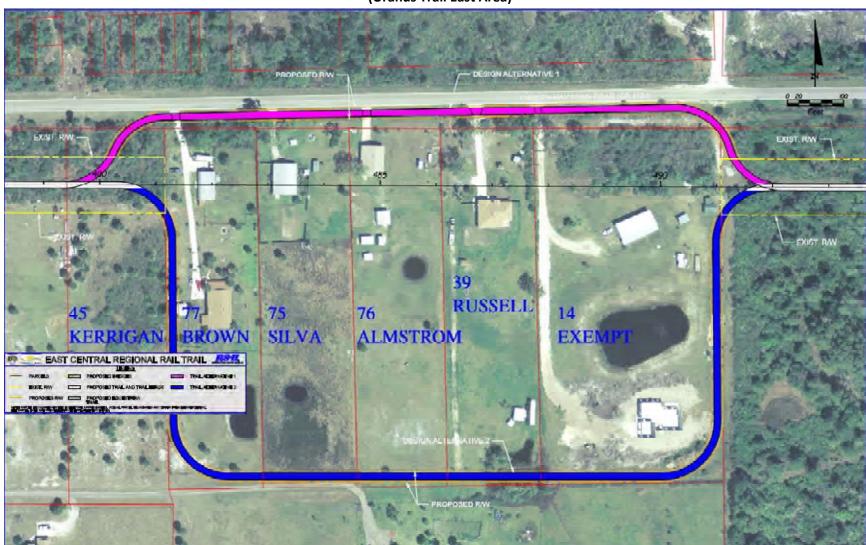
Alternative Alignment Section Sta 479 to Sta 492 (Uranus Trail East Area)
